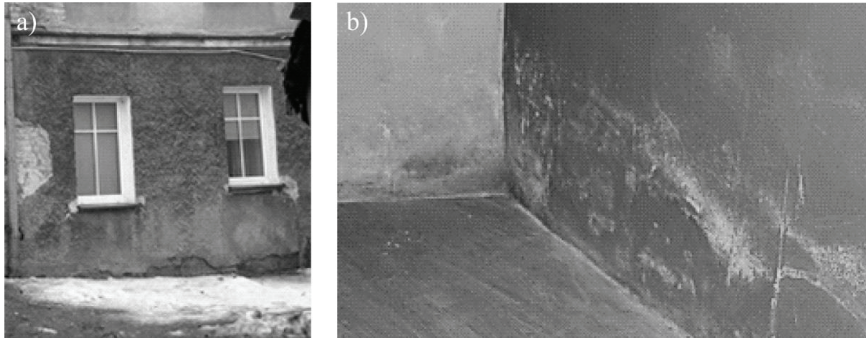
View of the damp walls of the ground floor covered with salt efflorescence and mould fungi: a) from the outside; b) from the inside.
